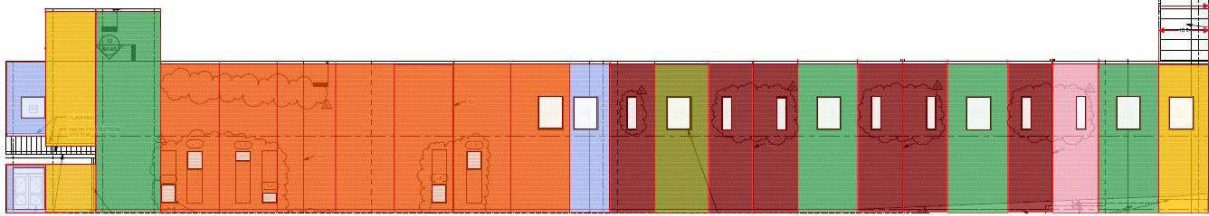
South Elevation Panel Breakdown. Image by George Andonie, modified from Sheet A3.1.2
